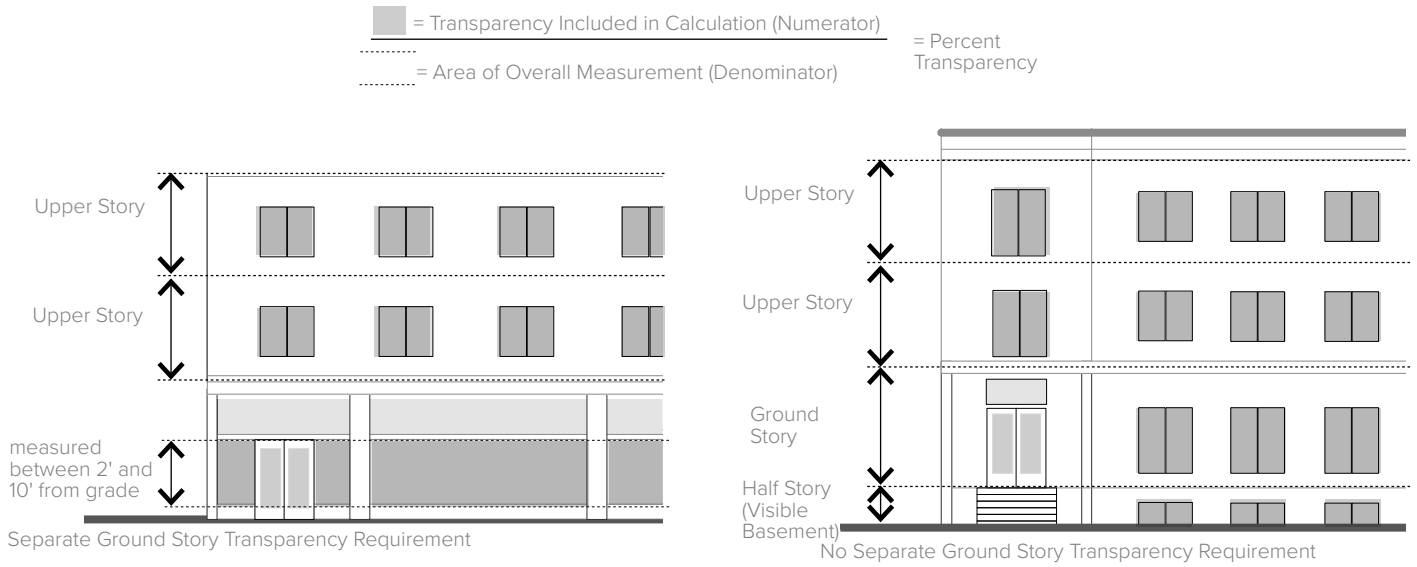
G. Measuring Transparency Floor-to-Floor
